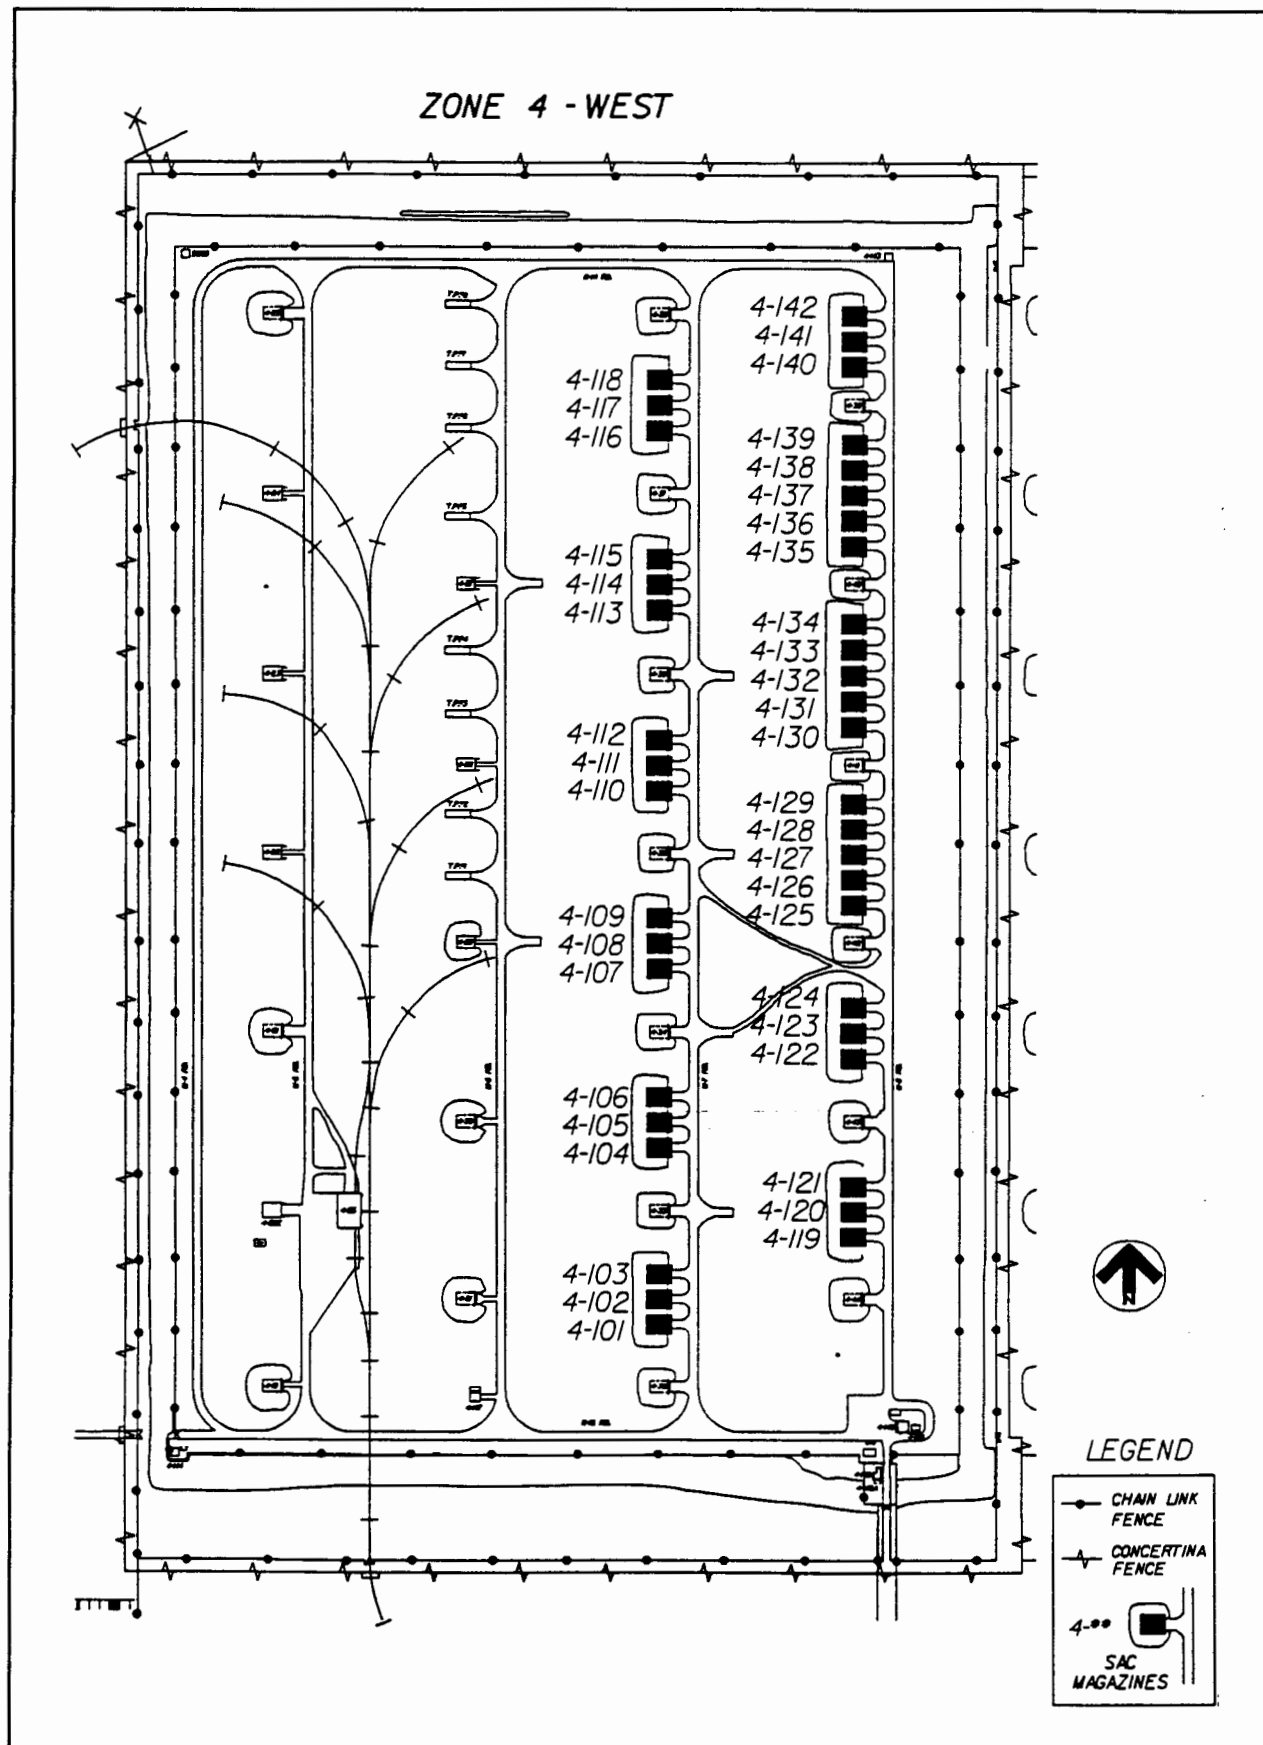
Layout of Zone 4 West and 42 Steel Arch Construction Magazines
